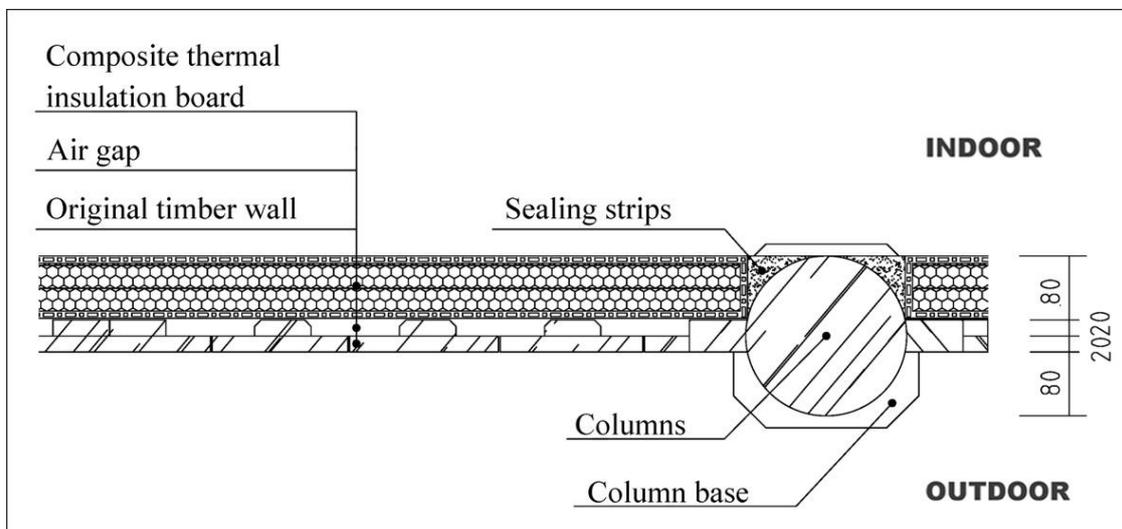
Cross section of thermal insulation wall retrofitting (maximum thickness).
